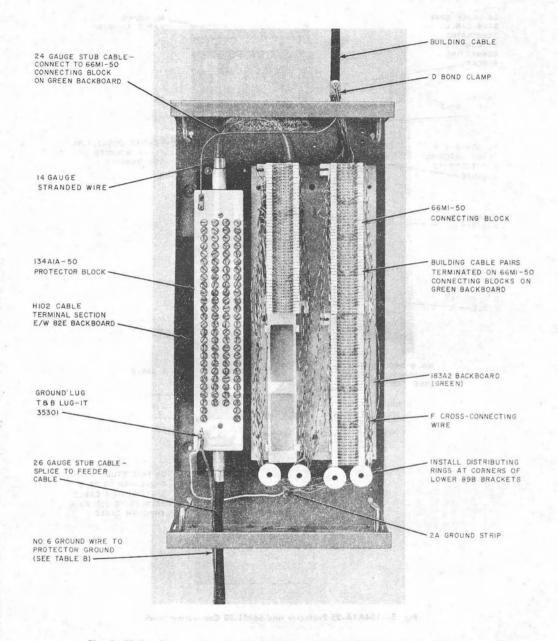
Pair Protected Building Terminal Mounted in H102 Cable Terminal Section
